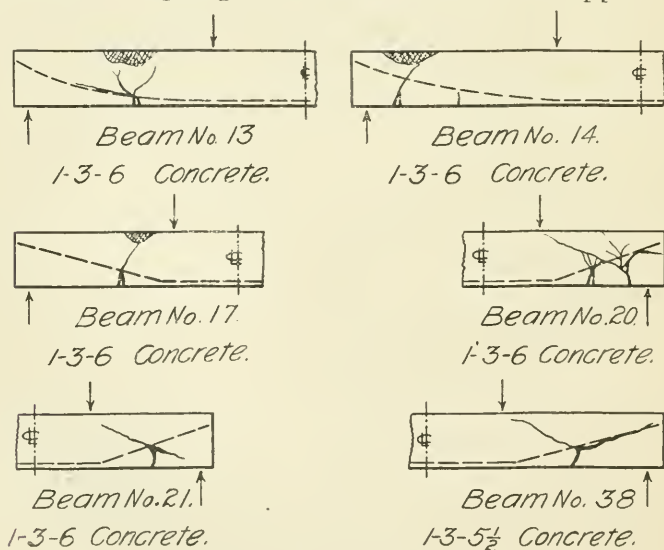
SKETCHES SHOWING BEAMS AFTER FAILURE.
